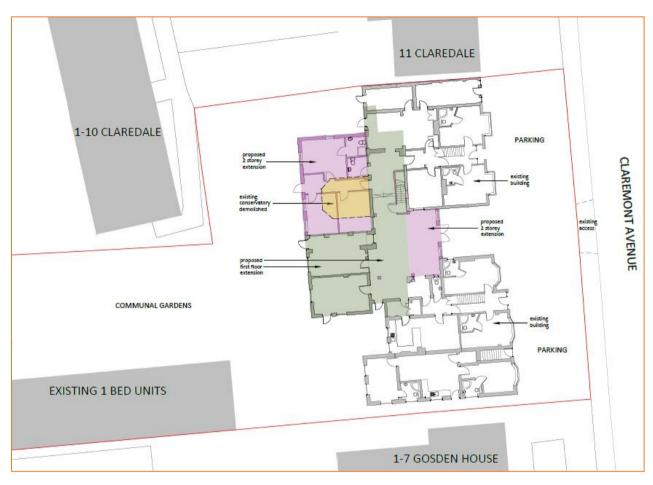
Proposed Site Plan (Source: Amber Architecture)
